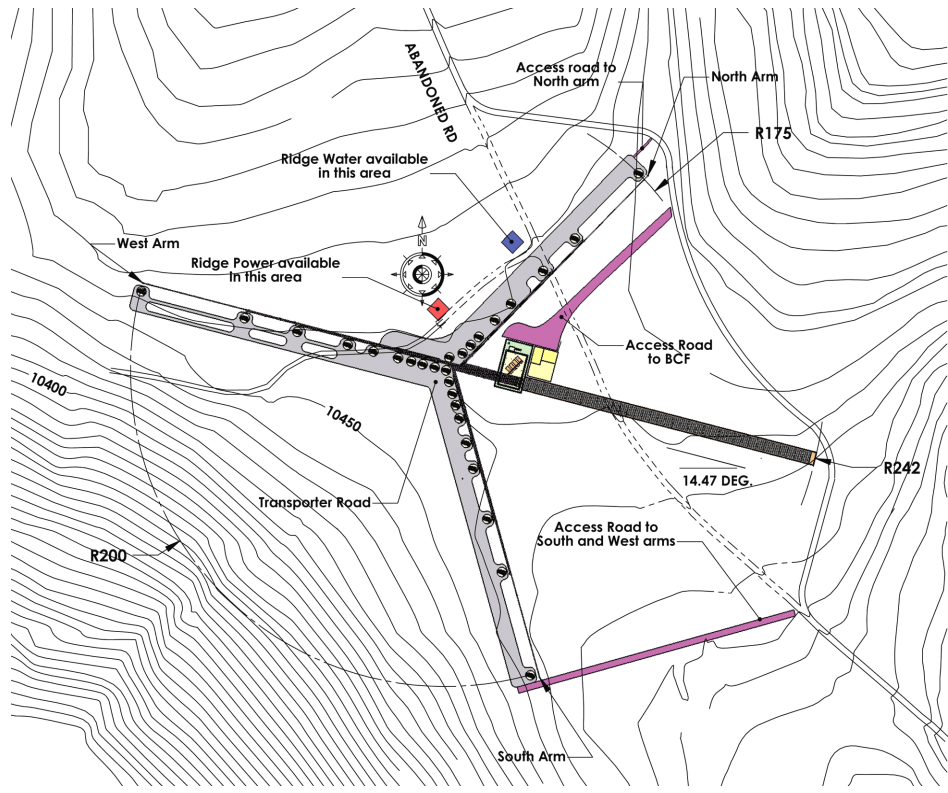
Plan view of the Magdalena Ridge showing the MROI array. The North arm is towards the top of the diagram and East to the right.
